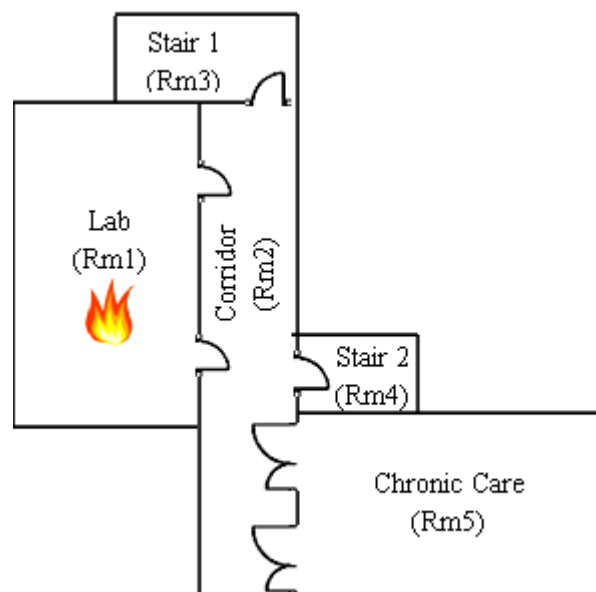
Geometry showing the rooms as modeled in BRANZFIRE – Lab fire on Floor 2
